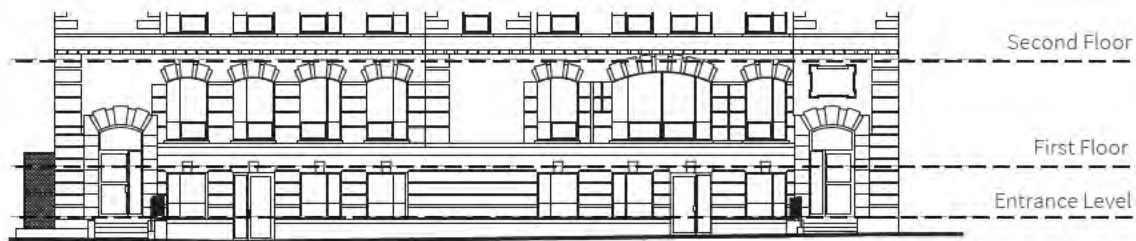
Existing east elevation (Wallman Architects, 2022; annotated by ERA).
